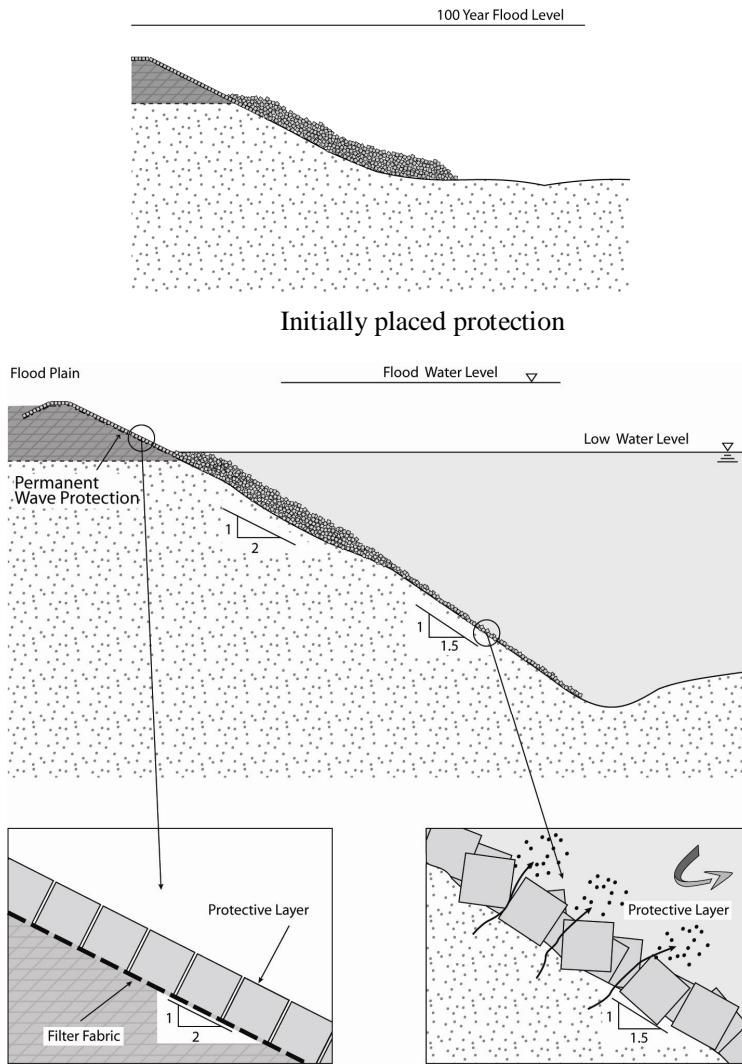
Initially placed protection and insufficiently protected steep underwater slope after launching, susceptible to winnowing (loss of sand through gaps between protective elements).
